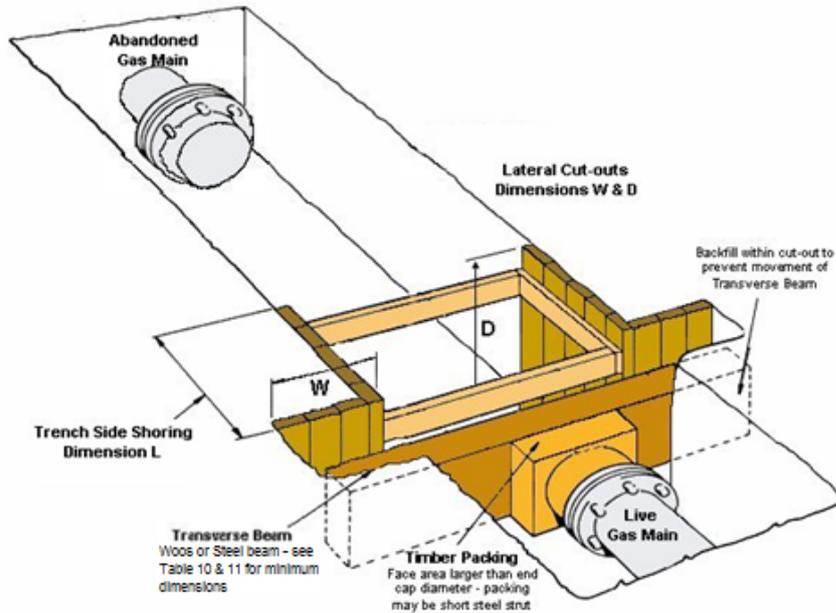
System 2: Anchorage up to 30 kN - Allowing Trench Access
